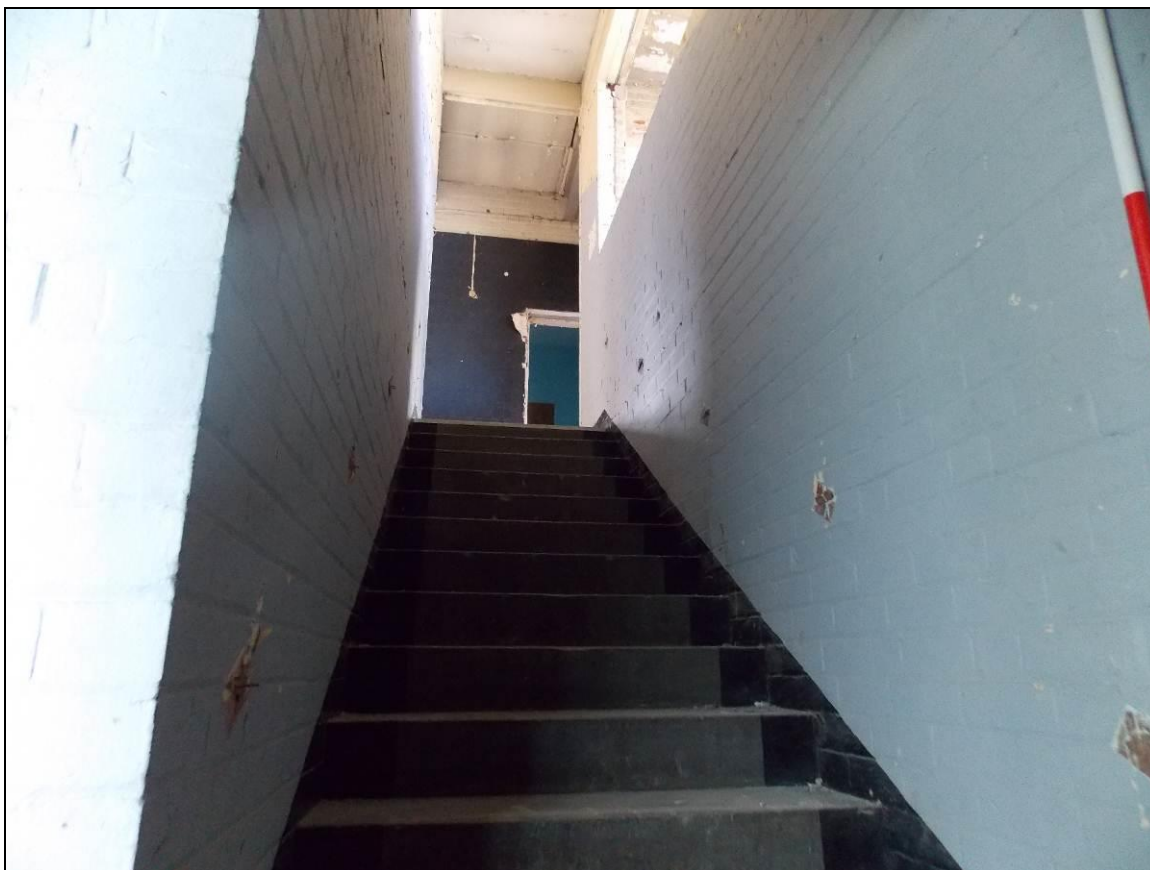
View of the staircase leading from the first floor to the second floor, facing south.
